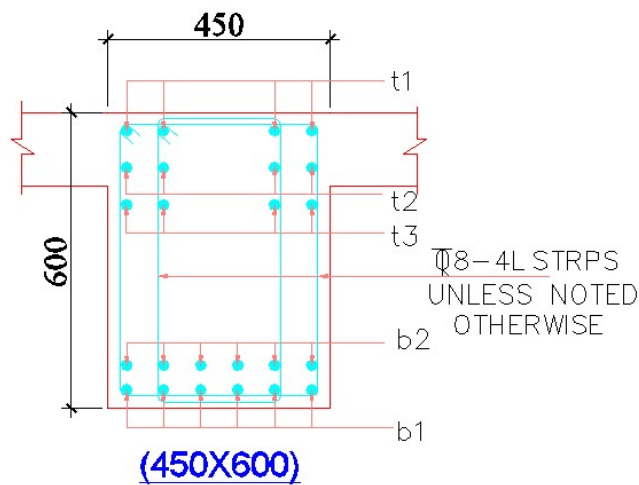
(d) - Typical cross section of beam showing location of bars and their notation
